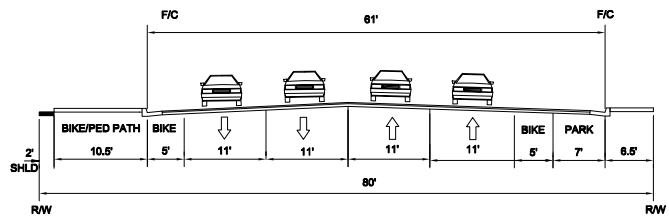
South Park Street Between Bercut Dr. and Crocker St. (looking east)
